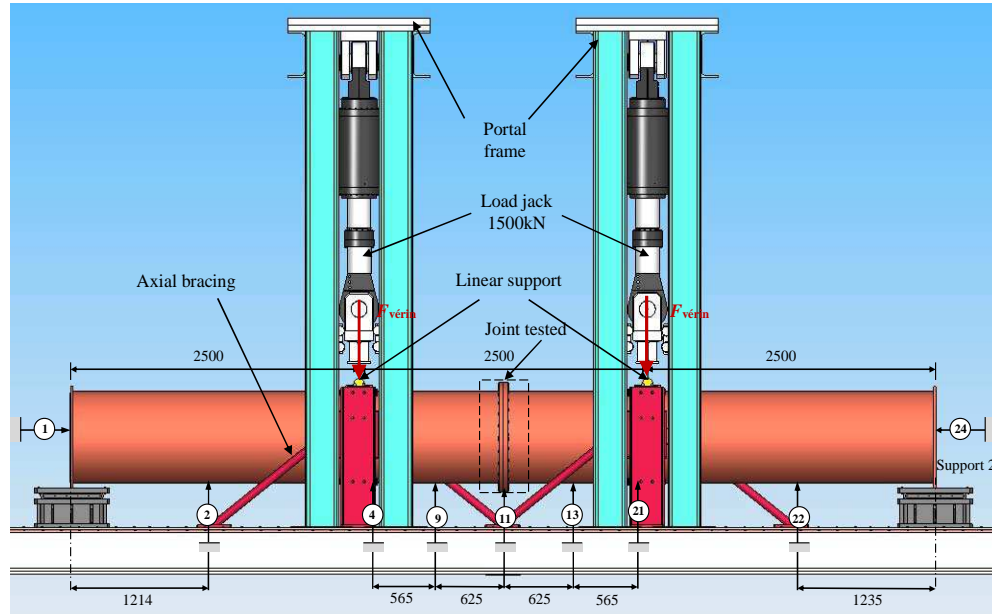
Set-up of 4 points bending test (dimensions in mm)
